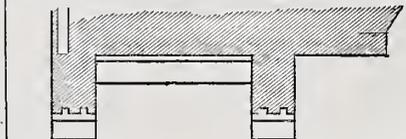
Horizontal Section through Supports to Mantel, Design B.—Scale, 1 1/2 Inches to the Foot.
